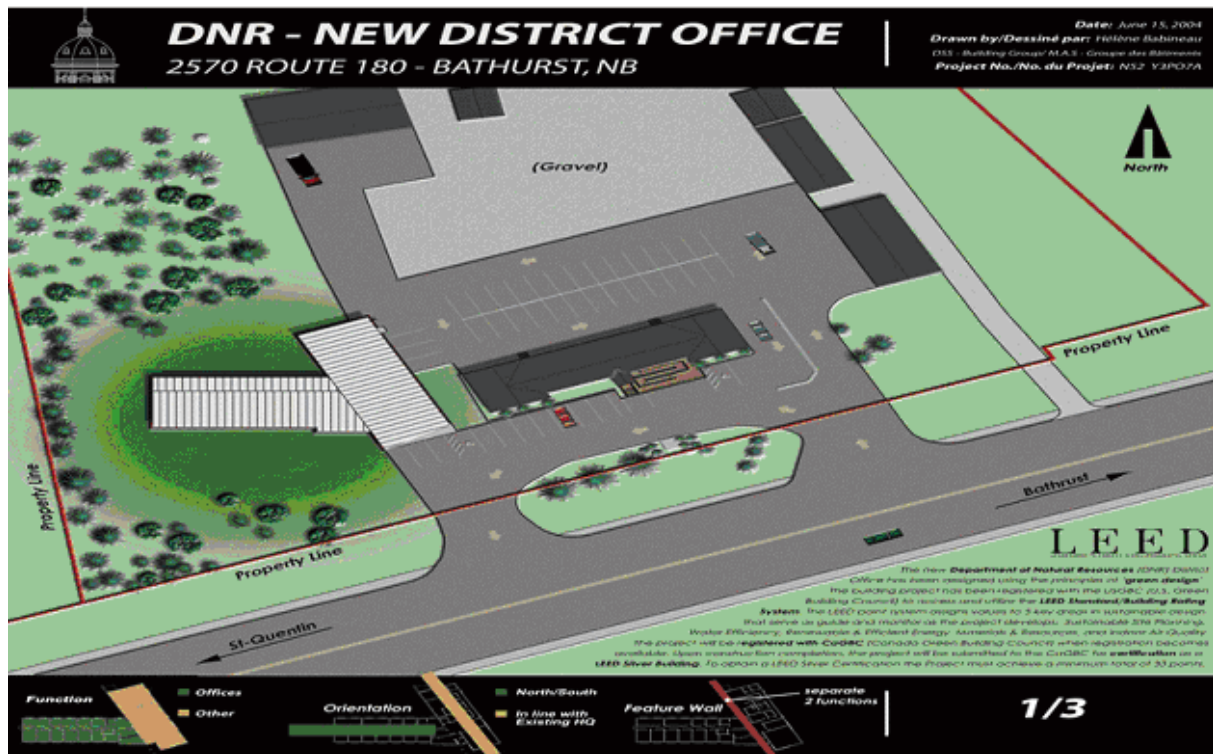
Site plan of the proposed NBDNR district office at Bathurst.
